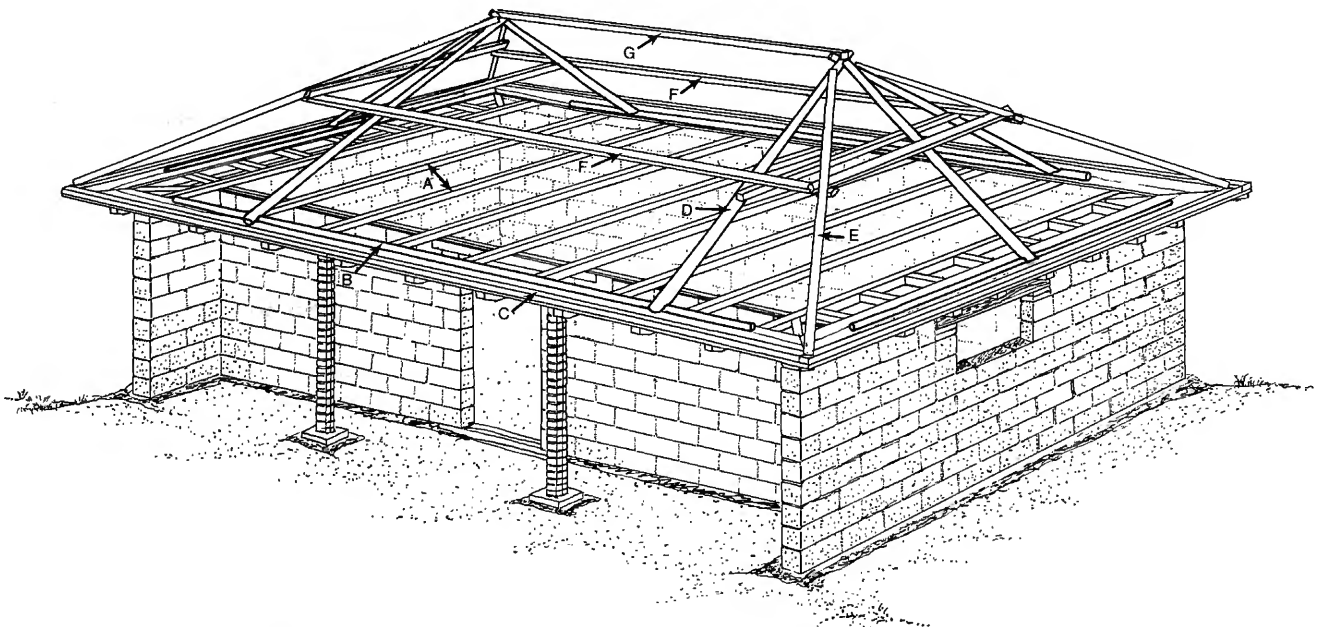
Block house in construction: A, tie beam, *legra*; B, roof beam plate, *chotleb chuk*; C, rafter plate, *chotleb legra*; D, main roof beam, *chuk*; E, corner rafter, *eskina te'*; F, purlin, *moriyo*; G, ridge pole, *jol tzel*.
